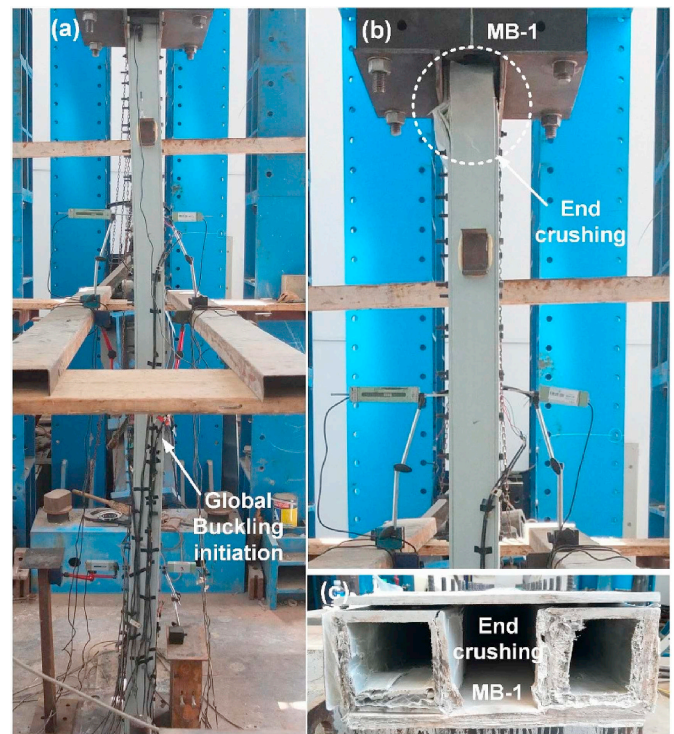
Failure modes of specimen MB-1: (a) global buckling initiation; (b) side view of end crushing; (c) cross-sectional view of end crushing.
